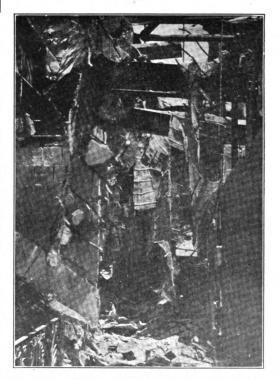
Top of Crocker Building. Ruins due to burning of wooden roof.
